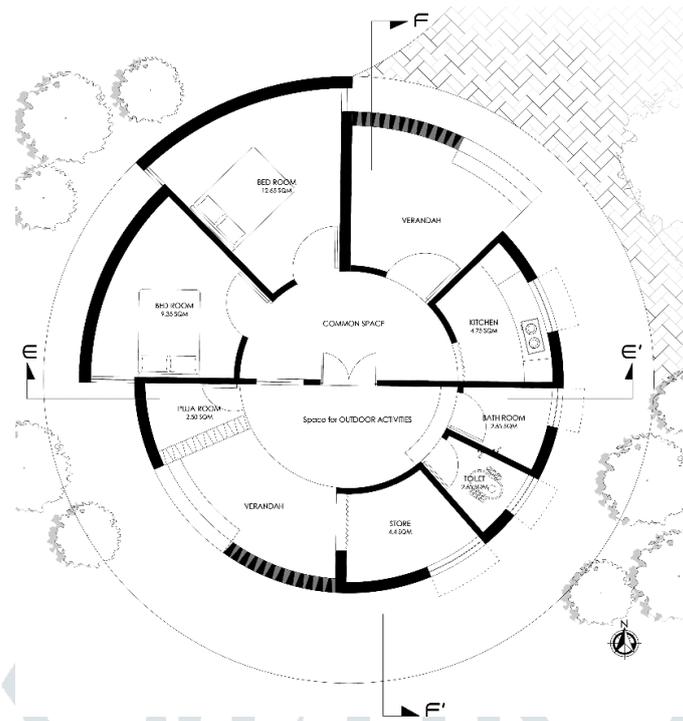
Proposed typical floor plan of 70sqm of fishermen residence. Source: (Author).
